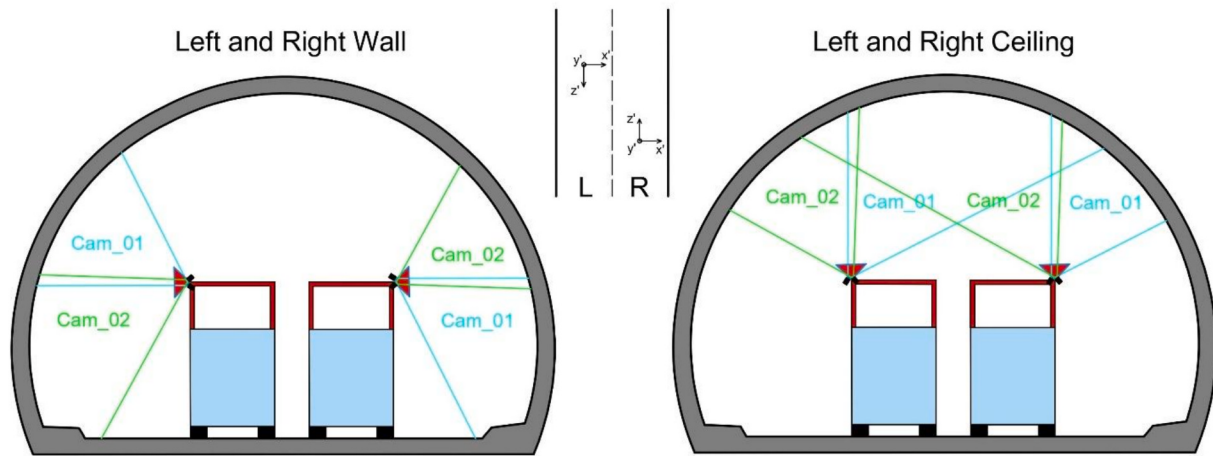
Schematic of image acquisition with n. 2 cameras (Cam_01 and Cam_02) on the tunnel cross-section for Left and Right Wall and Left and Right Ceiling.
